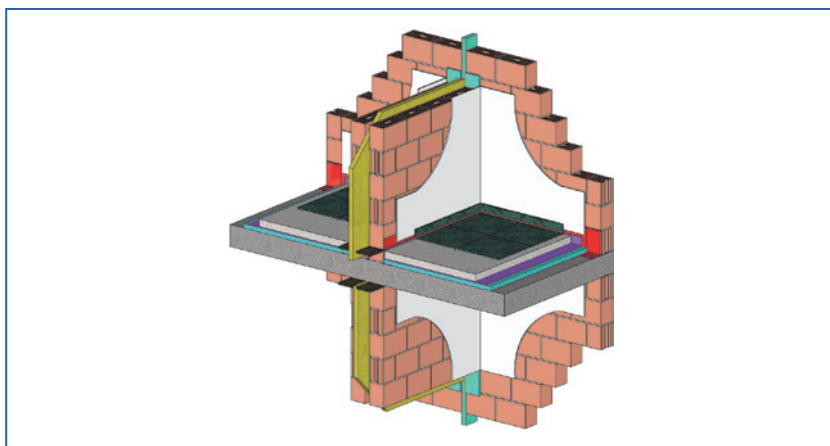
Building with continuous floor slabs, acoustic strips and semi-heavy not-load bearing double walls [[2] - (Belgium)].
